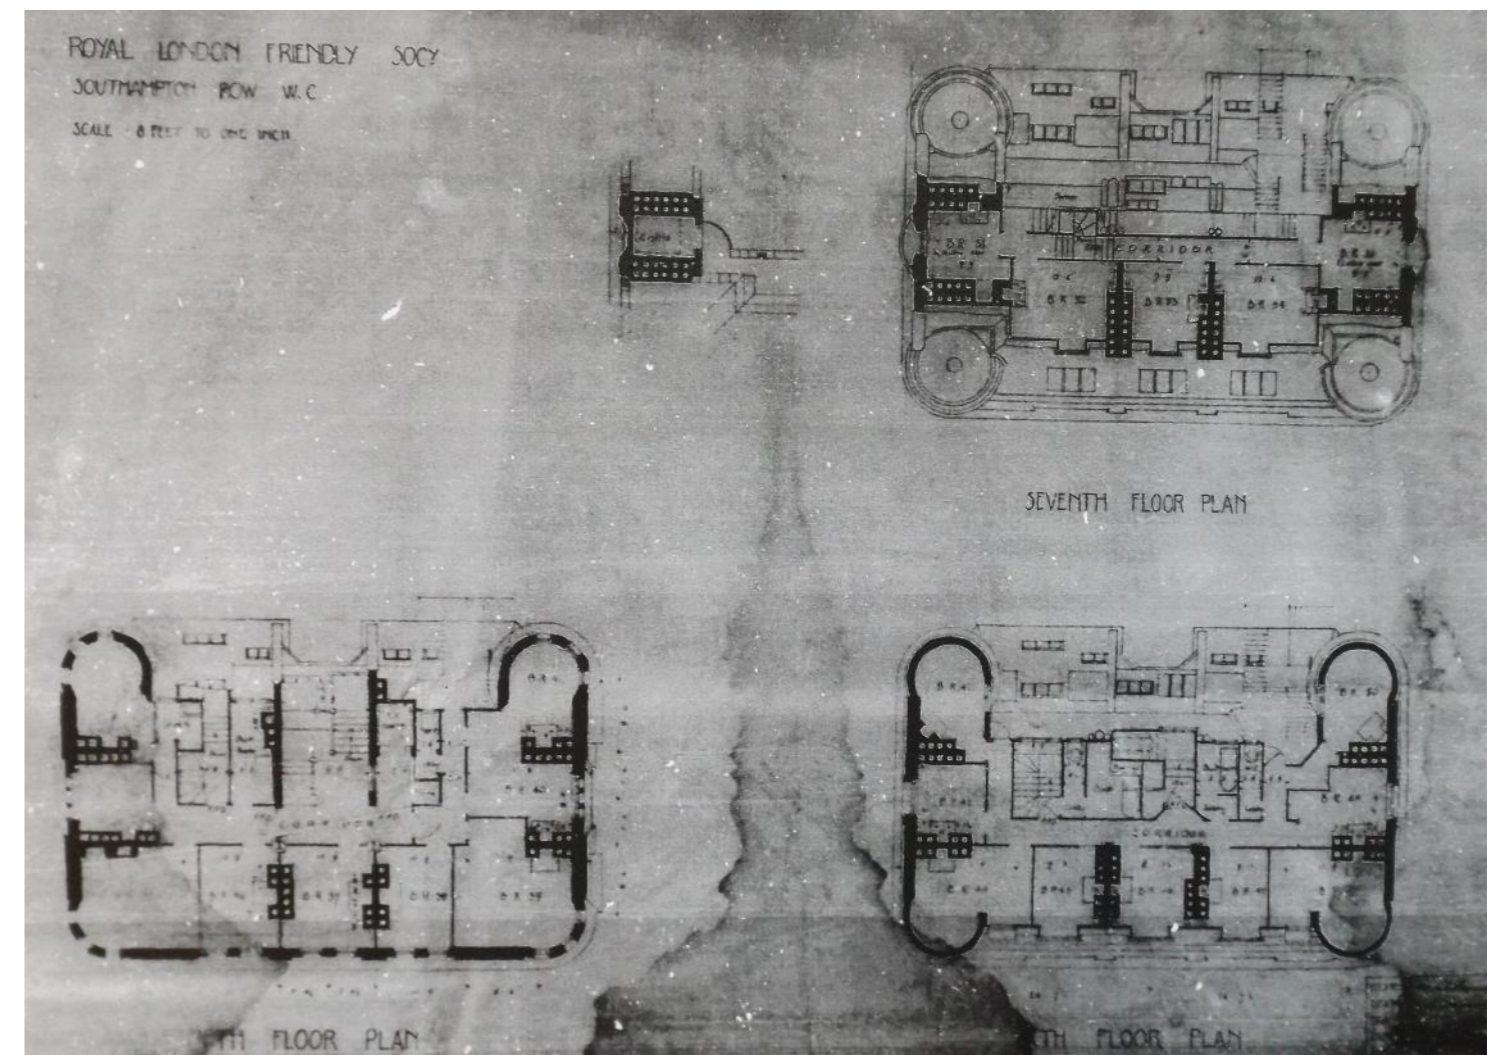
Top Floor Drainage plans of newly constructed building (1905)
